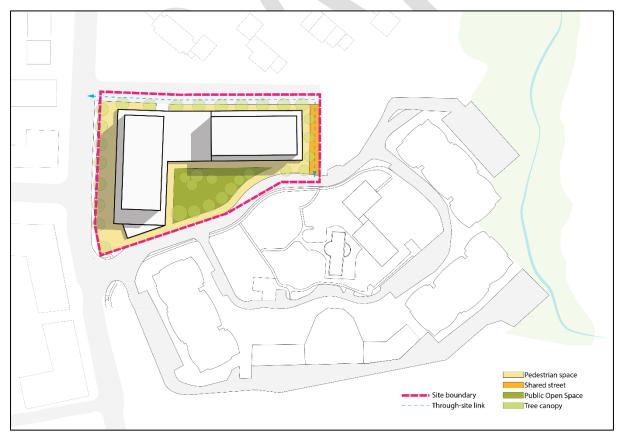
Public Domain Concept for 93 Bridge Road, Westmead (Source: Distinctive, 2024)
